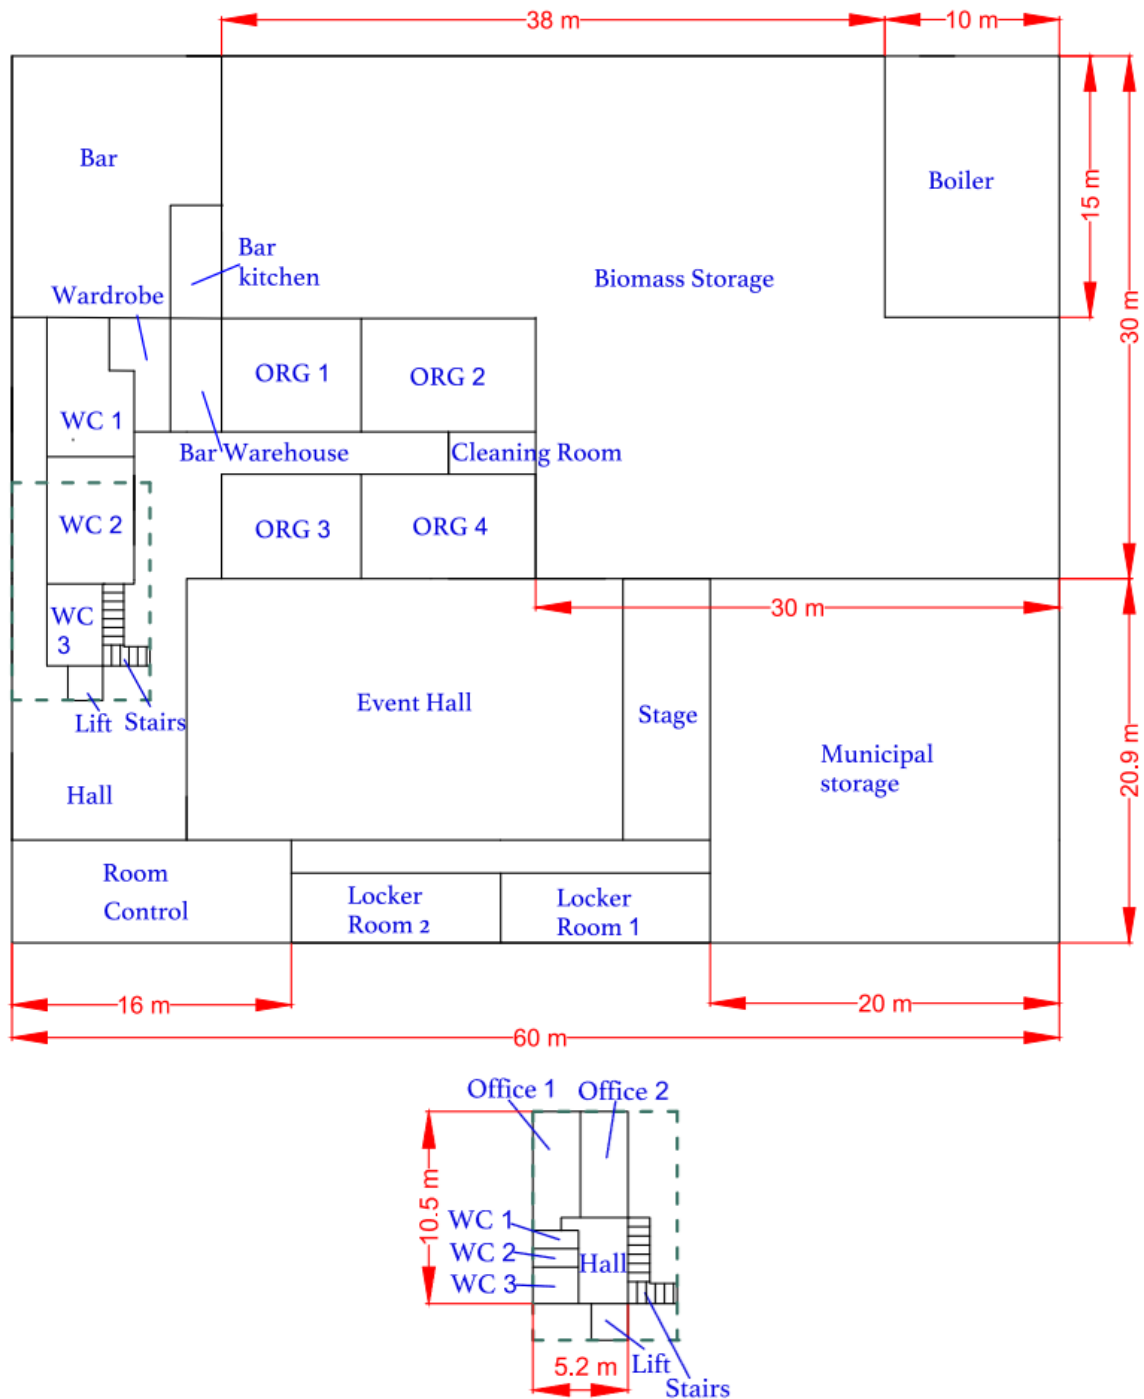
Indoor floor plan design of the three industrial buildings. (Author's own, adapted with AutoCAD). The asbestos roofs will have to be reconditioned due to the installation of solar panels. Compared to the prices of various local enterprises, it is estimated that the new roof would cost around €100,000. The PV cells adapt effortlessly to different types of roofs. However, the most suitable material would be sheet metal or sandwich panels since they offer stability, resistance, and durability. (Dolomada.com, 2012; HostecServeis, 2015; Desamiantado, 2018; GDA, 2019). In terms of interior design, the cost of the refurbishment is not considered as it is completely relative and would depend on the specific equipment and facilities that would be selected.
